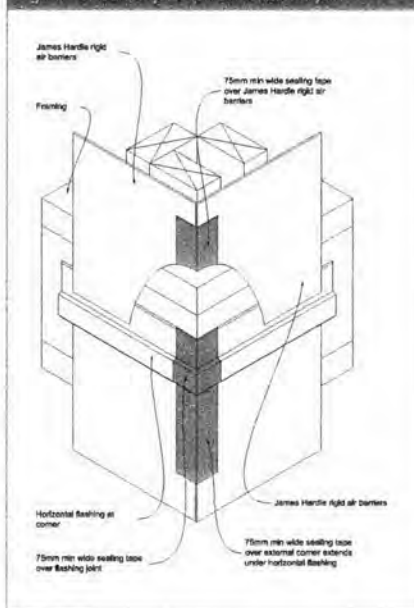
RAB Board used as backing board for stucco plaster/proprietary cladding systems
